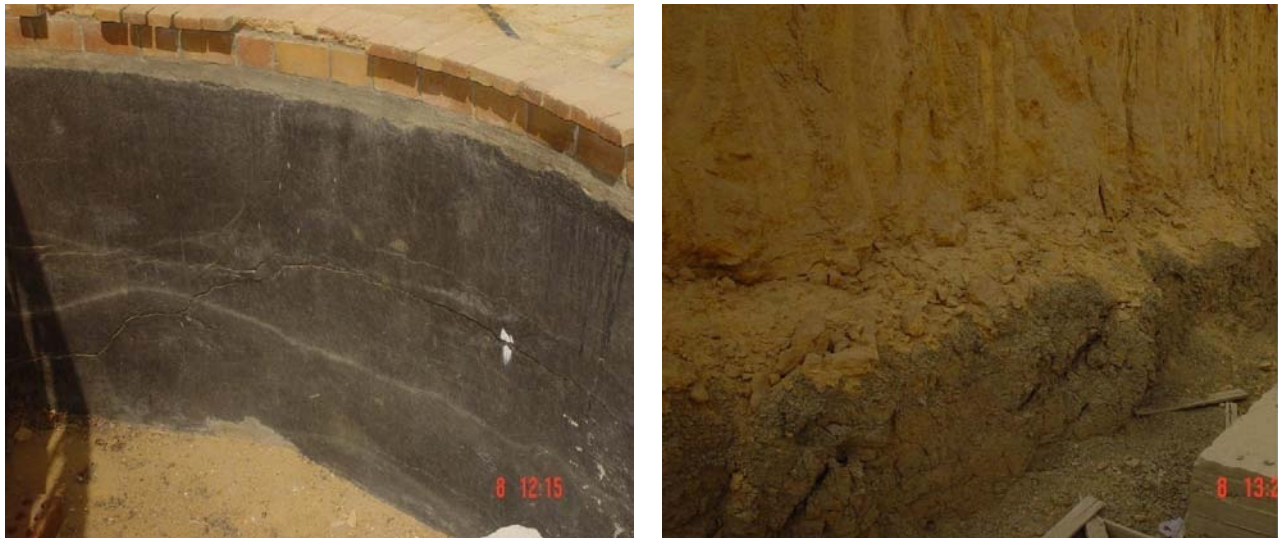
Al-ShoroukVilla cracks, and foundation surrounding soil
